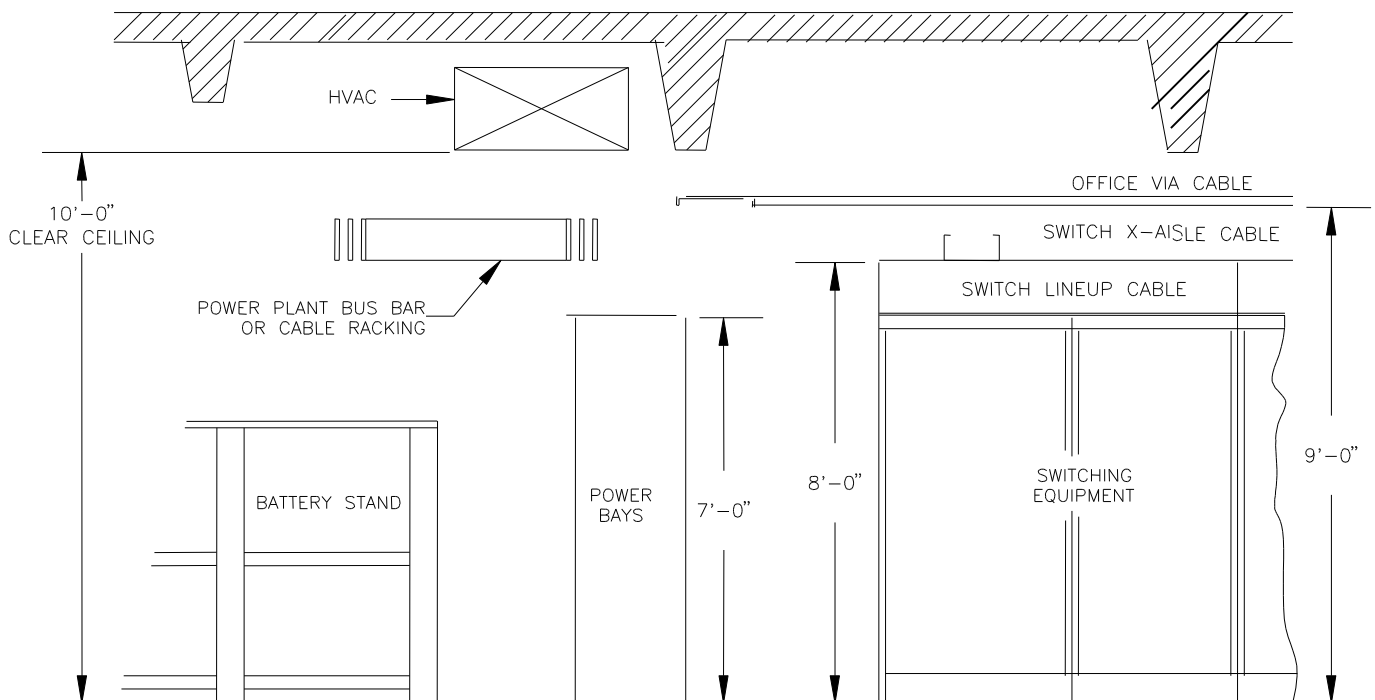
Generic Layout Of Office Superstructure Support Channel
